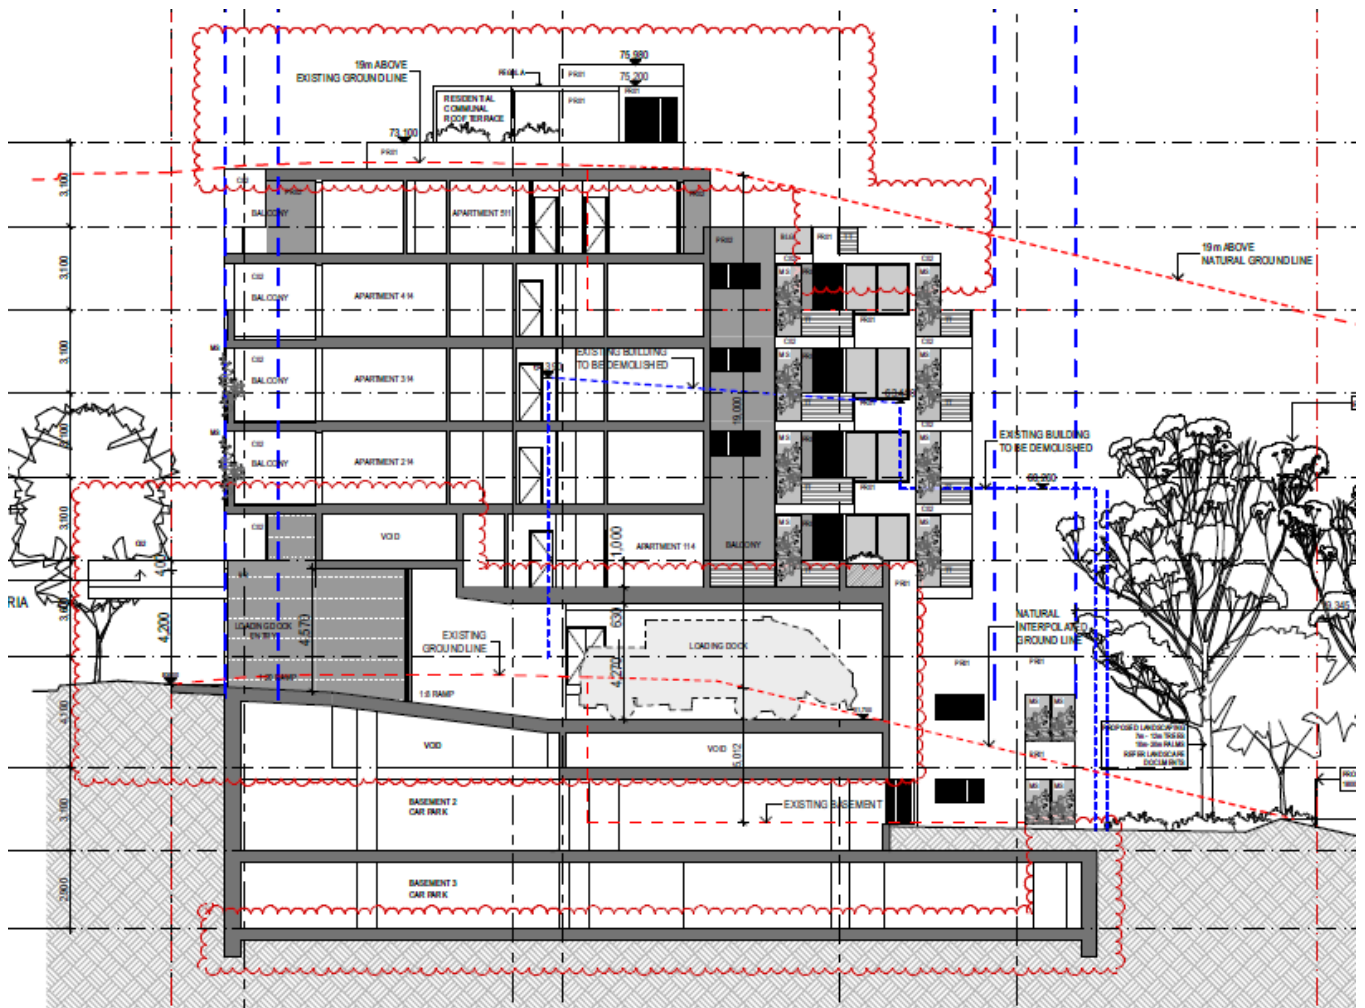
Extract from the Applicant's Clause 4.6 Variation demonstration Section EE from the Architectural Plans.
